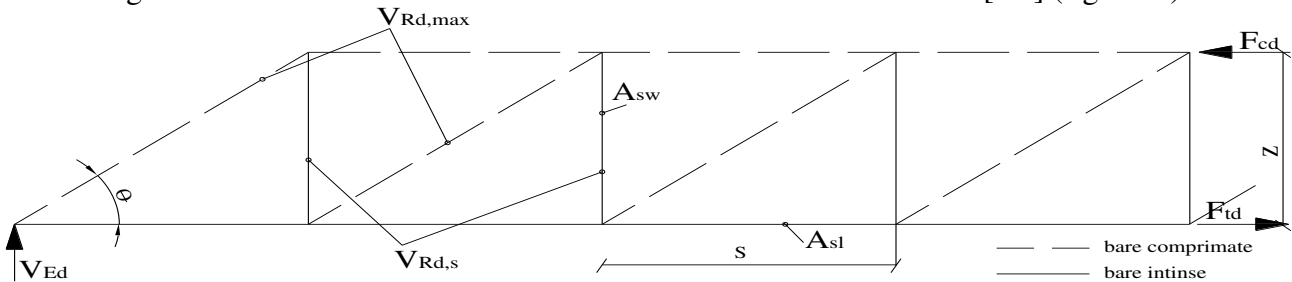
Calculation model under the shear force with stirrups[1.7.]
